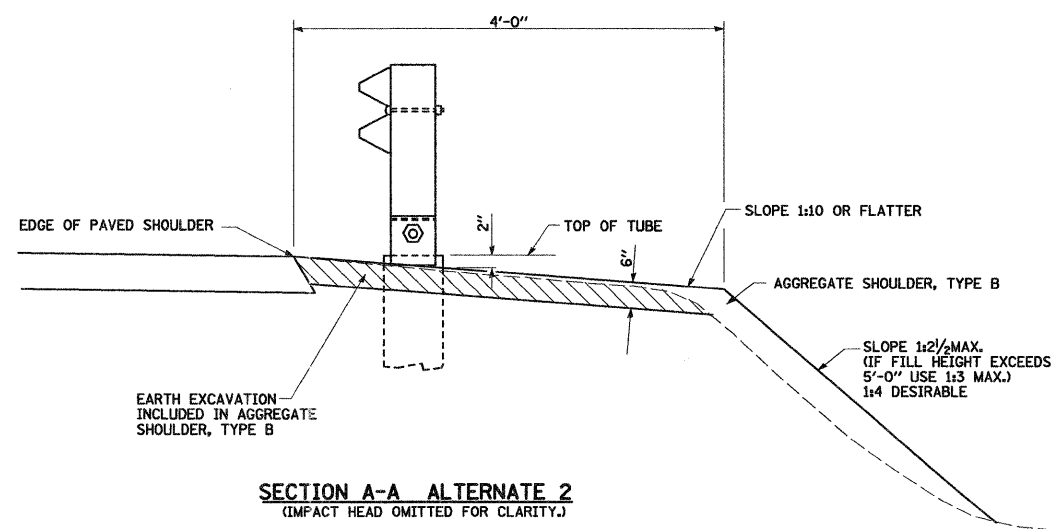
DETAIL OF TRAFFIC BARRIER TERMINAL CONNECTION TO PROPOSED GUARDRAIL SPLICE
